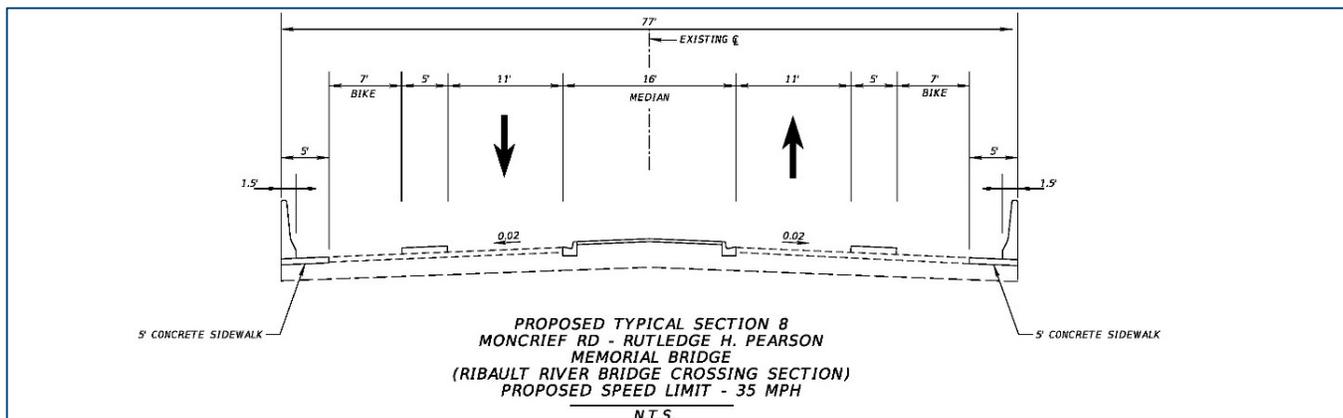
Proposed Typical Section (Rutledge H. Pearson Memorial Bridge)
